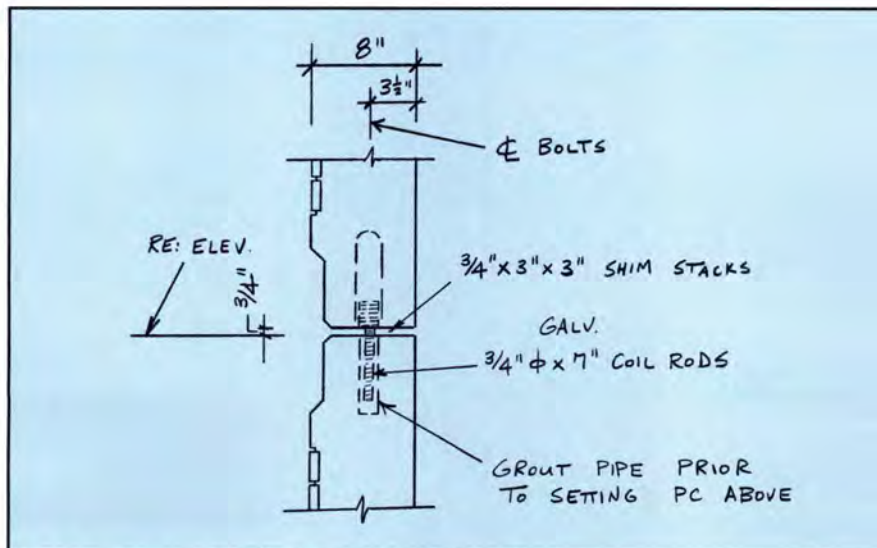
Precast panel-to-panel connection (see Fig. 7).
